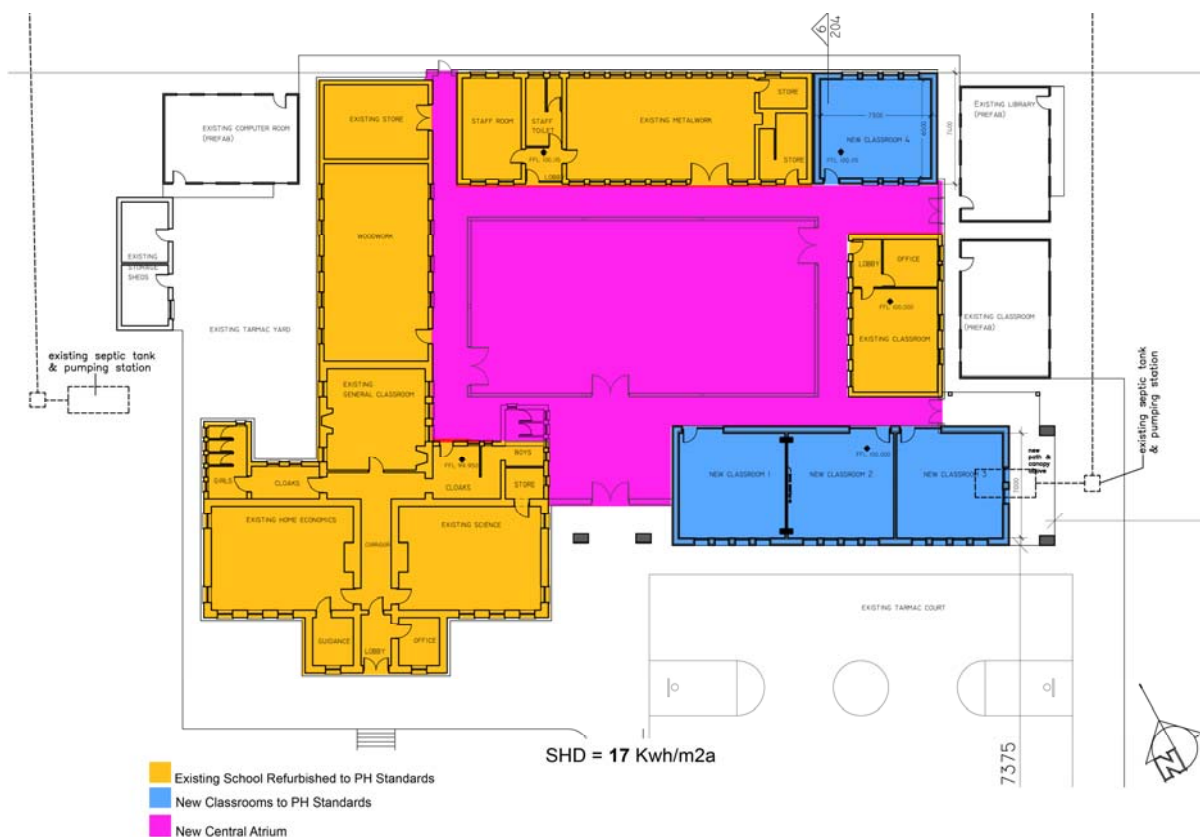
Floor plan illustrating new central atrium enclosing all buildings into one block - not to scale [MosArt, 2014]
